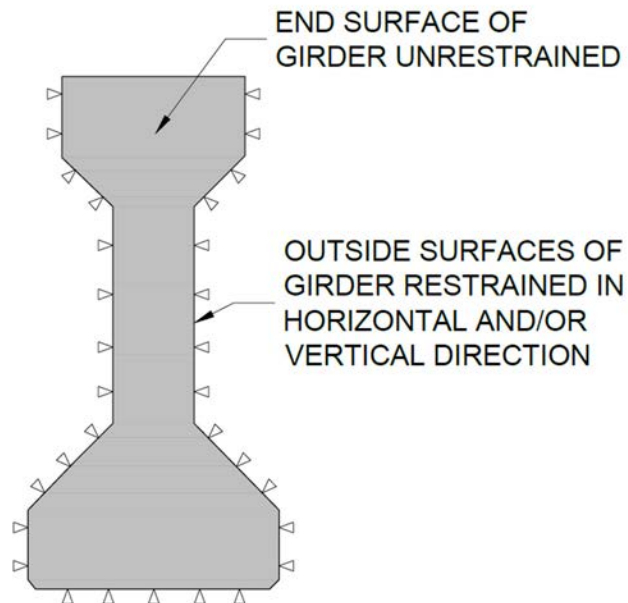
Details of restraints provided at girder ends with concrete diaphragms.
